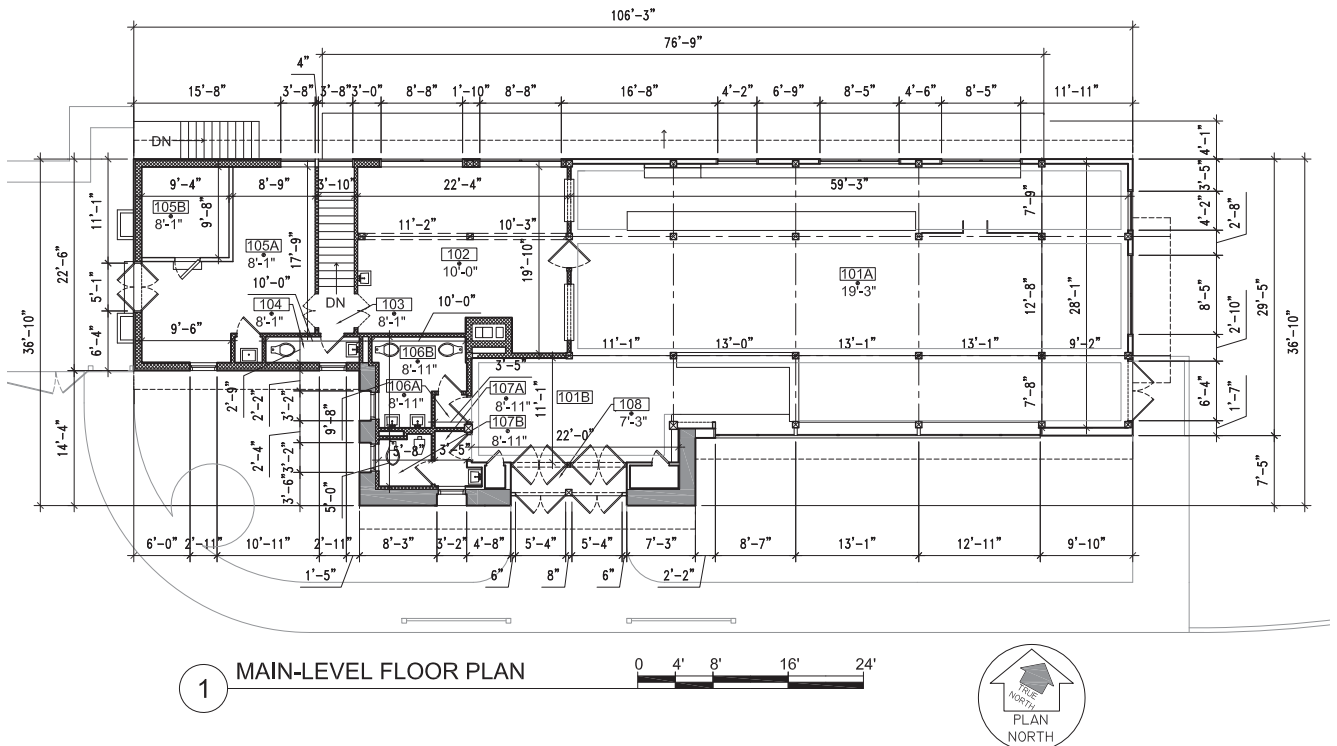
Main-floor plan. A larger version of this plan can be found in *Appendix B*.
